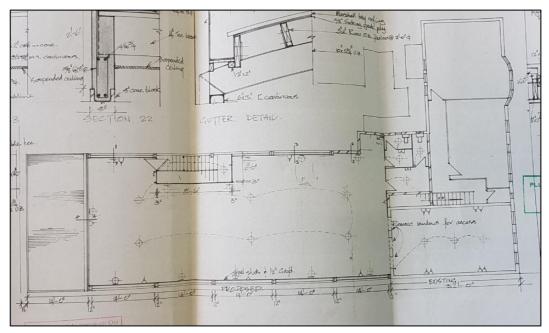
Detail from 1973 plan, showing the first floor plan of Carter's building (V. Jackson, 1973).
